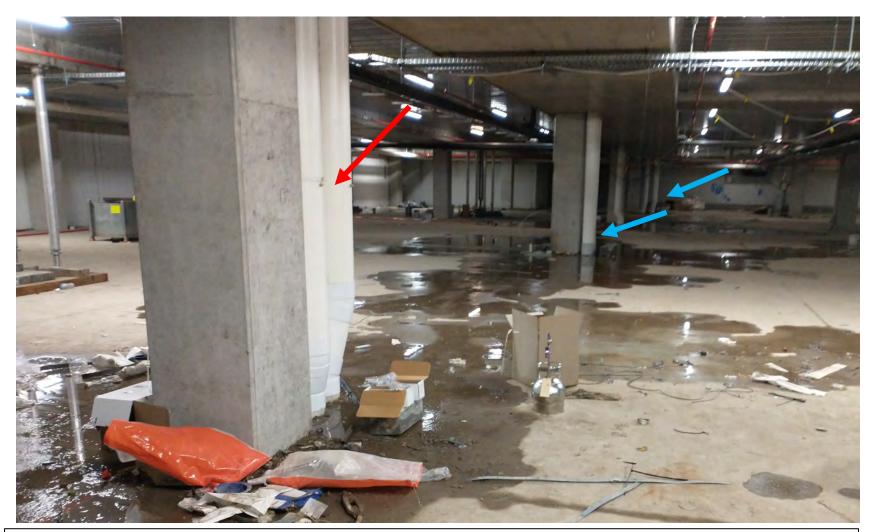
(facing west): View within SSA#2 of two air inlet pipes from the driveway area above SSA#2. These pipes extend below the floor and continue east to the SVVS beneath SSA#1.
